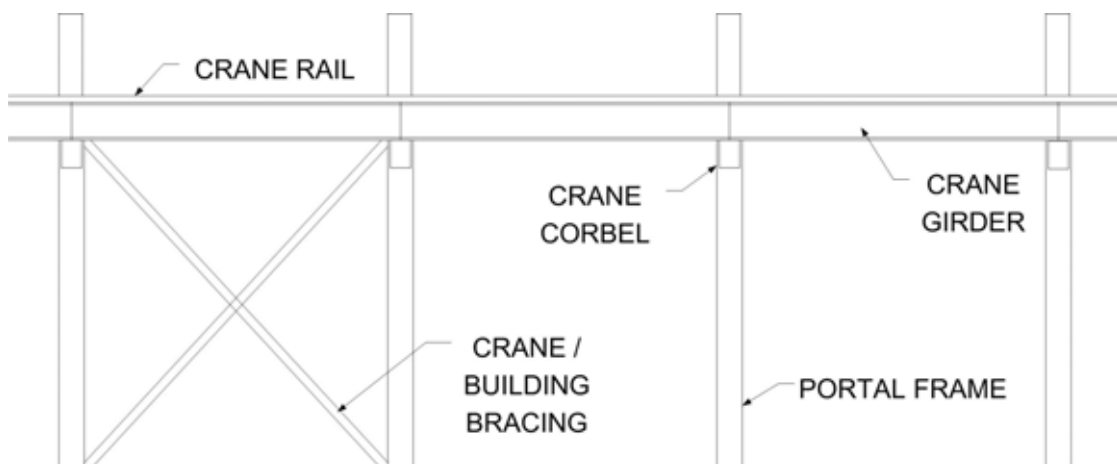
A side view of a portal frame structure with the crane girders resting on brackets.
